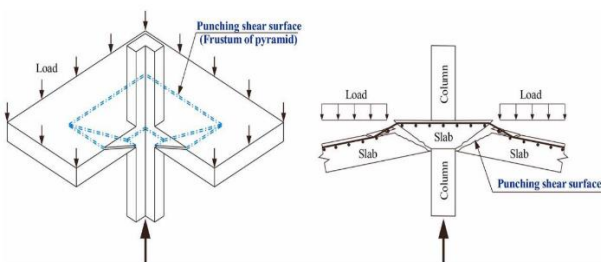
Slabs without beams (Flat Slab and Flat Plate) [9]
